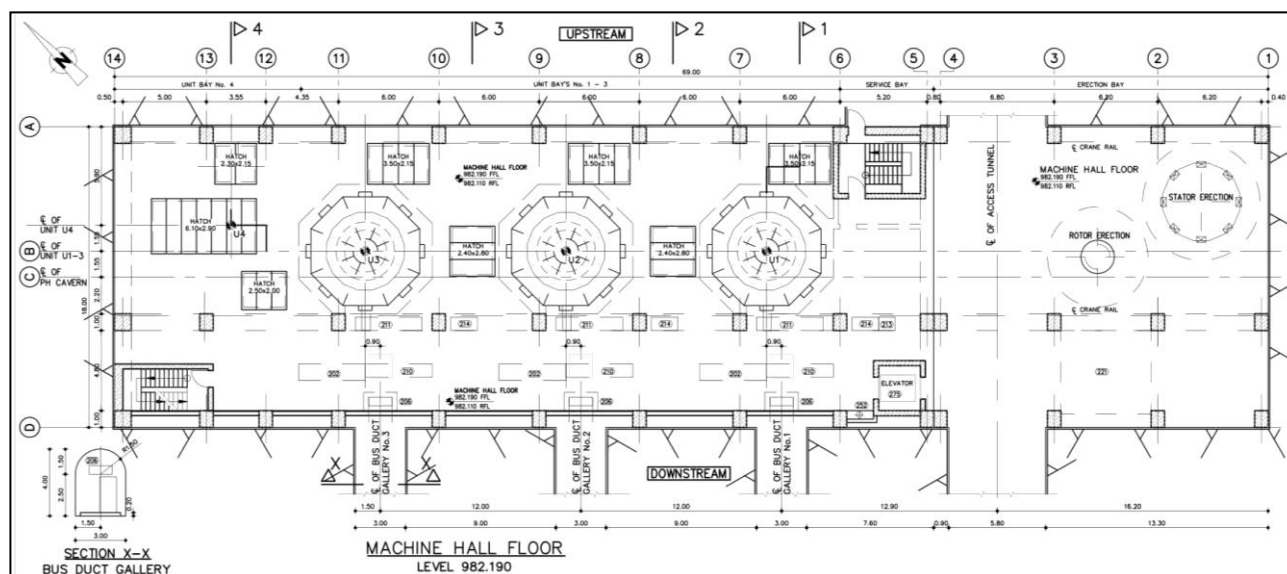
Plan View of the Powerhouse Floor (El. 982.19 m)
